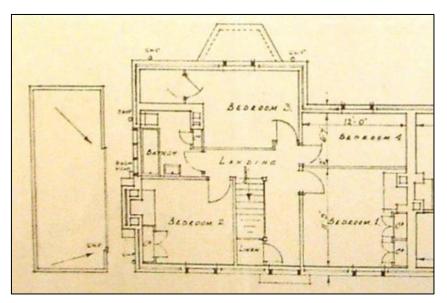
1948 first floor plan design of 115 Willifield Way (Hampstead Garden Suburb Trust)
